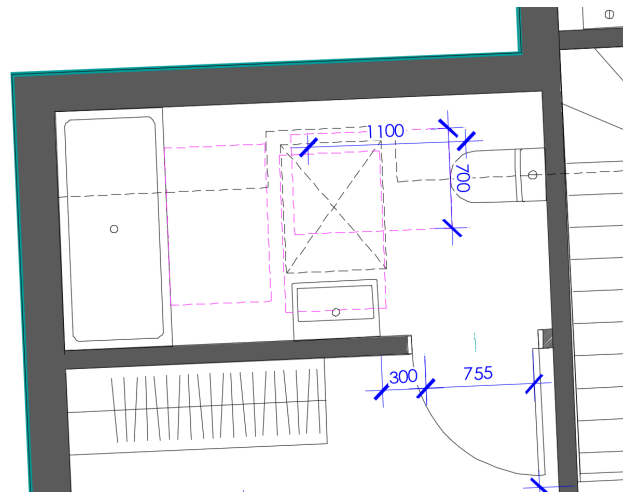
Sample plan of a proposed bathroom within Plots 7
